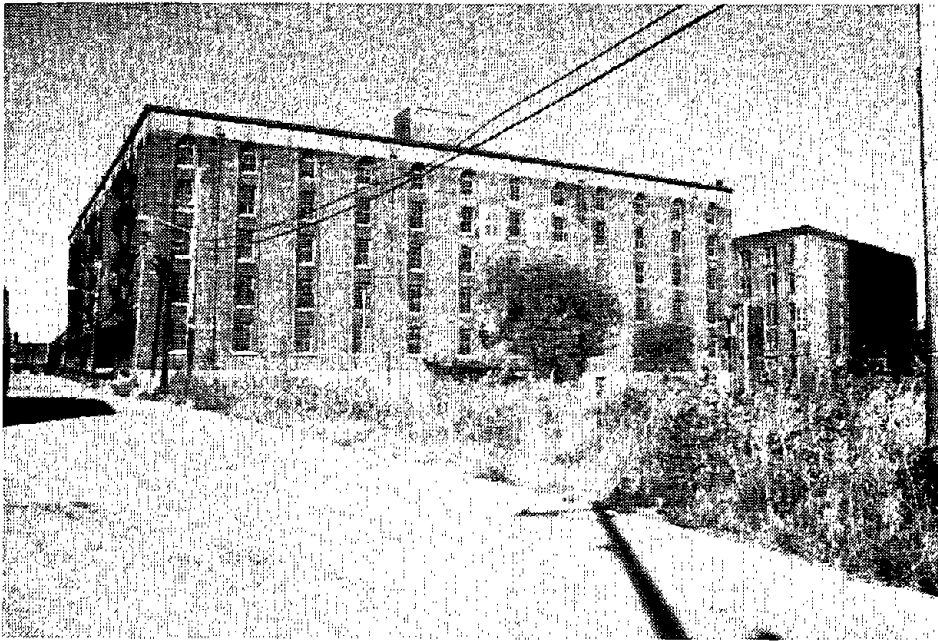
URM INDUSTRIAL BUILDINGS,
